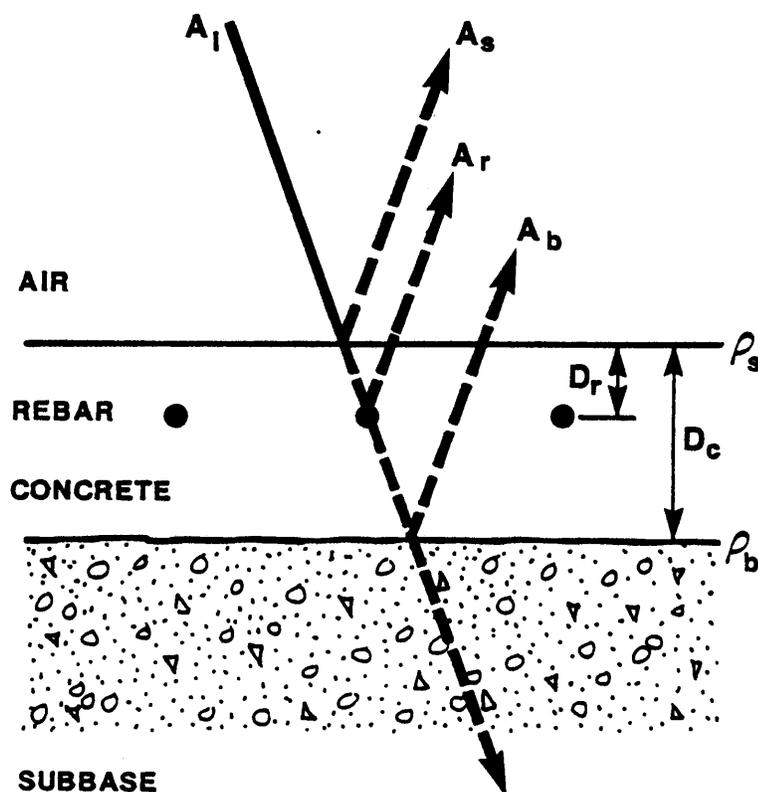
Propagation of microwave energy through a reinforced concrete pavement.
